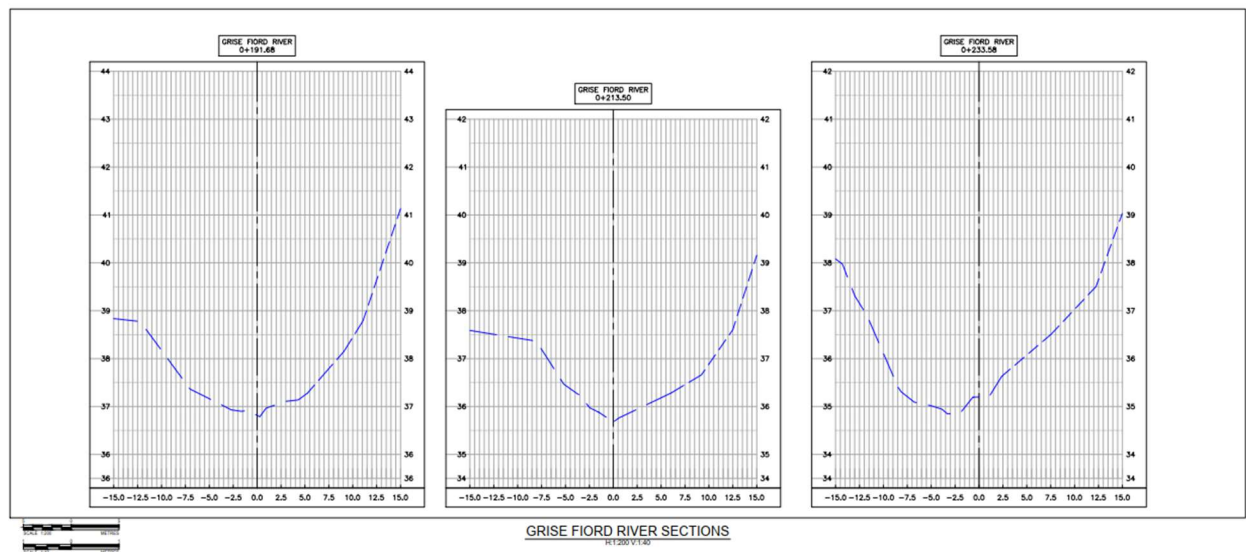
Cross-Sectional Profiles of Section 1 0+191, Section 2 0+213, and Section 3 0+233
